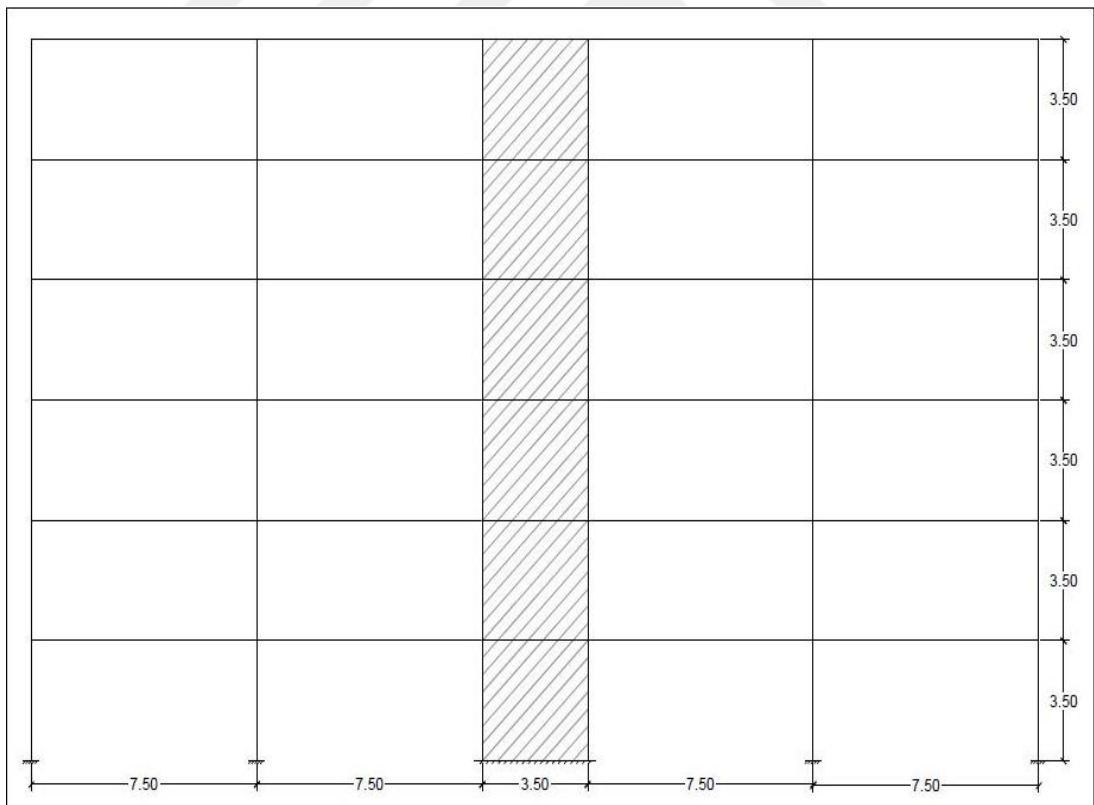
Elevation of 6-story building with steel plate shear walls having different plate thicknesses
